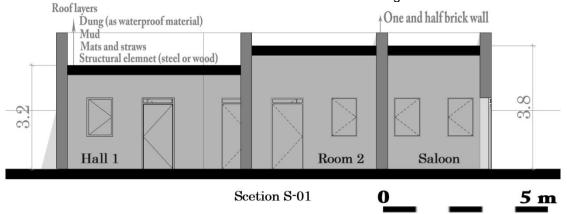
Single floor house section (S-01) shows the most common heights of the spaces
